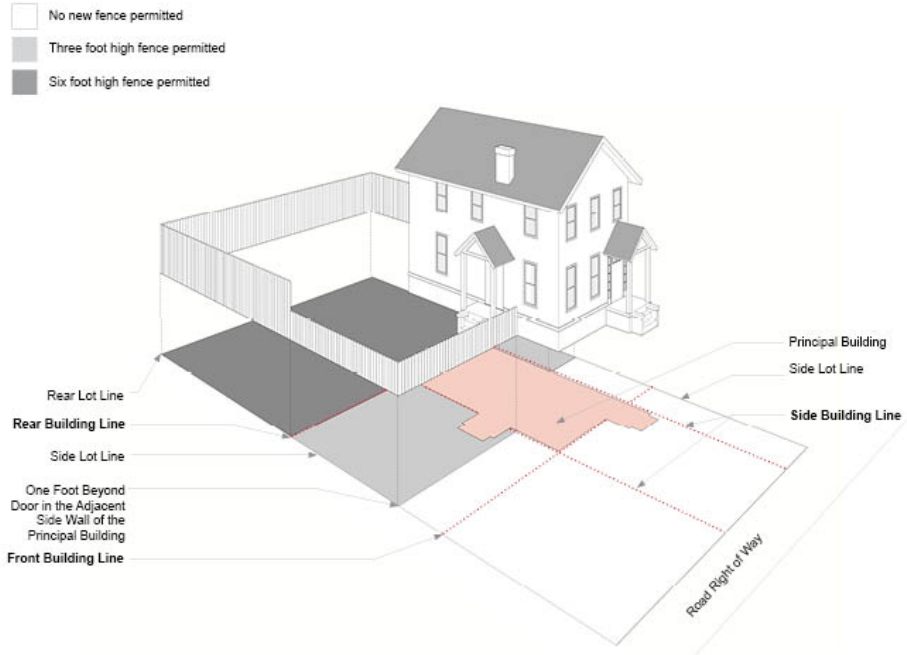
b: House on Interior Lot- Fence Behind Door in Adjacent Side Wall Option B
